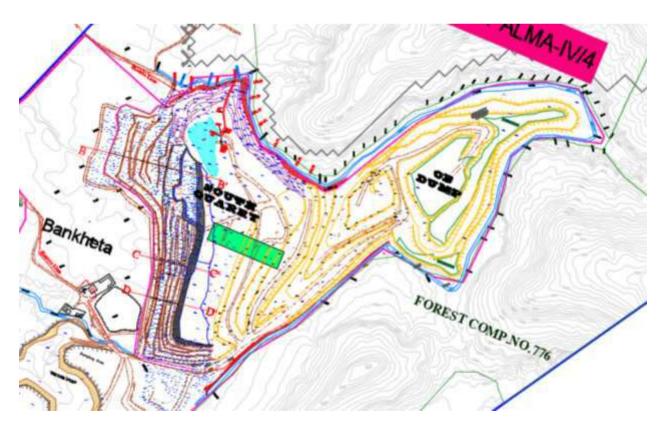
Positions of section B-B', C-C' & D-D' in existing pit of southh quarry of Gare Palma IV/4
